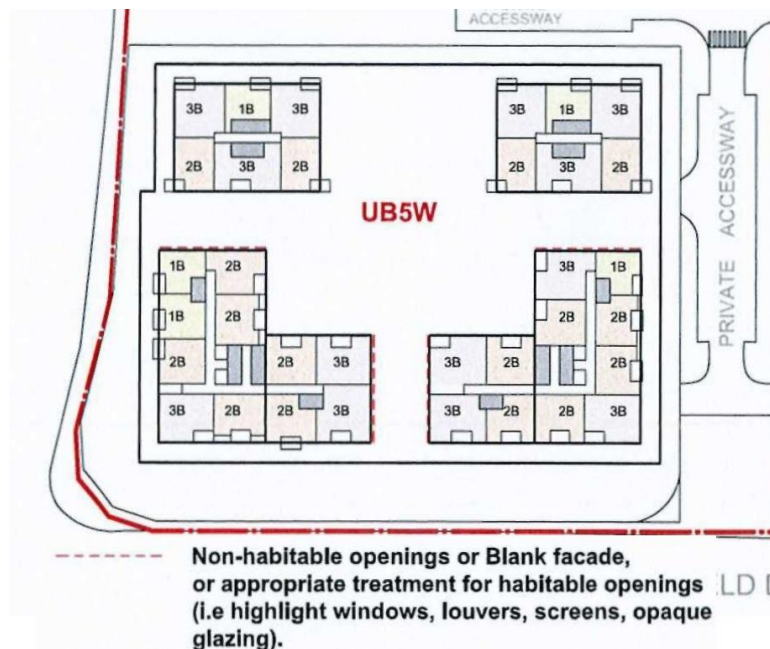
Indicative Apartment Layouts Stage 1 consent DA-14/96
